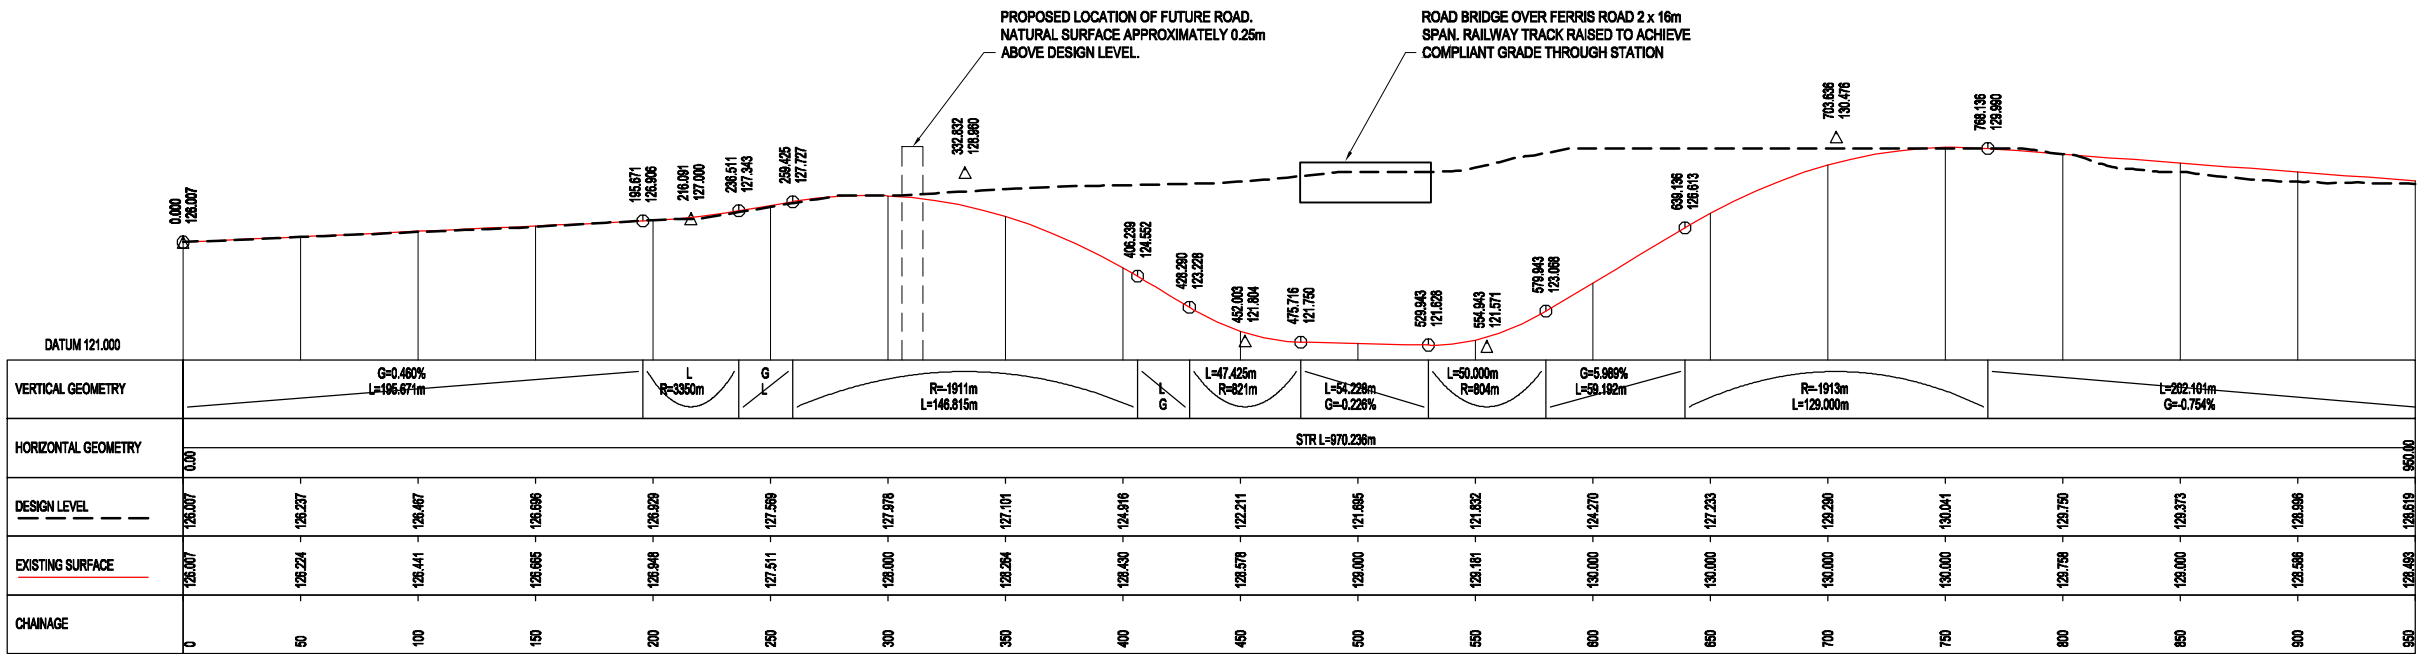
Ferris Road Underpass Long Section - Rail Option 1
